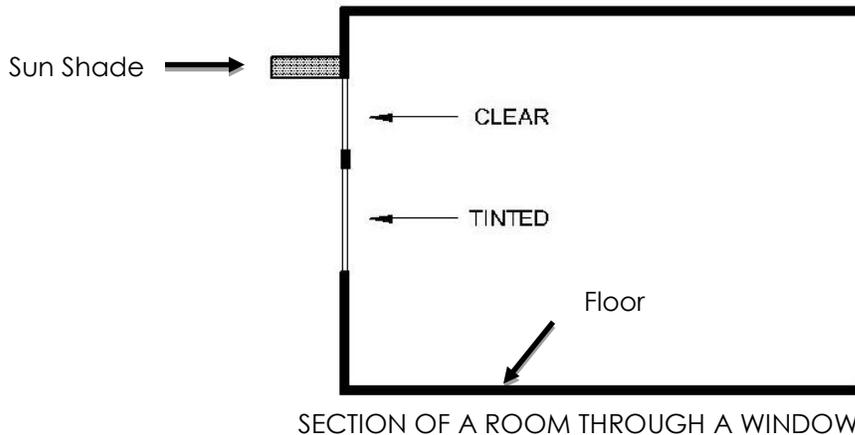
ARRANGEMENT SHOWING VISION WINDOW AREA AND DAY LIGHT WINDOW AREA
